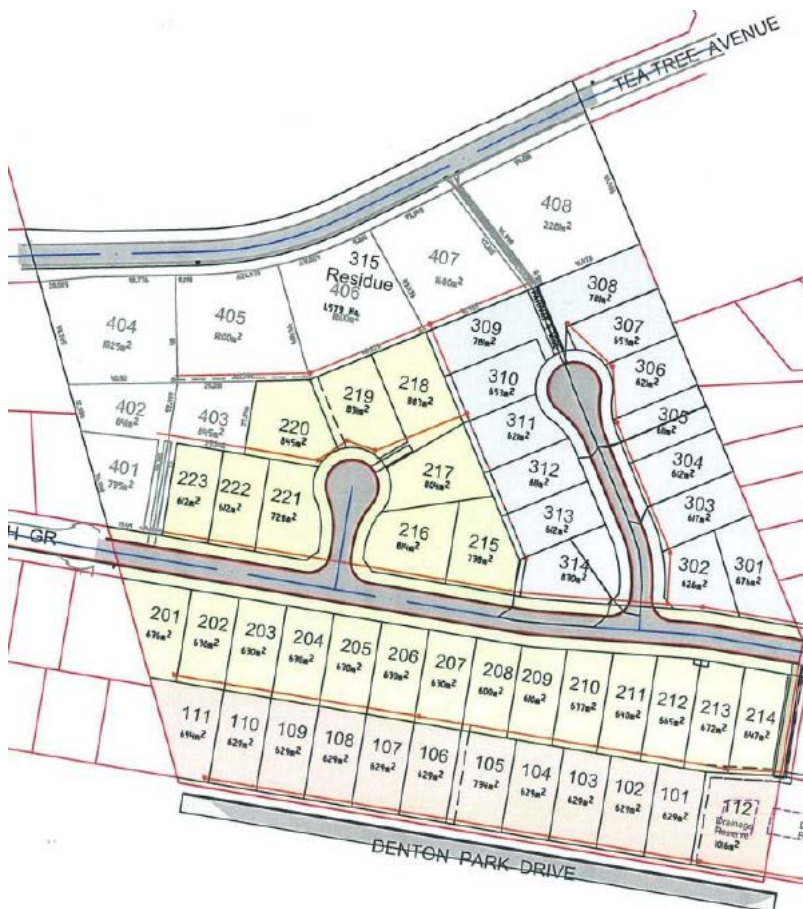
Subject site – subdivision plan (DA/2018/1972).
